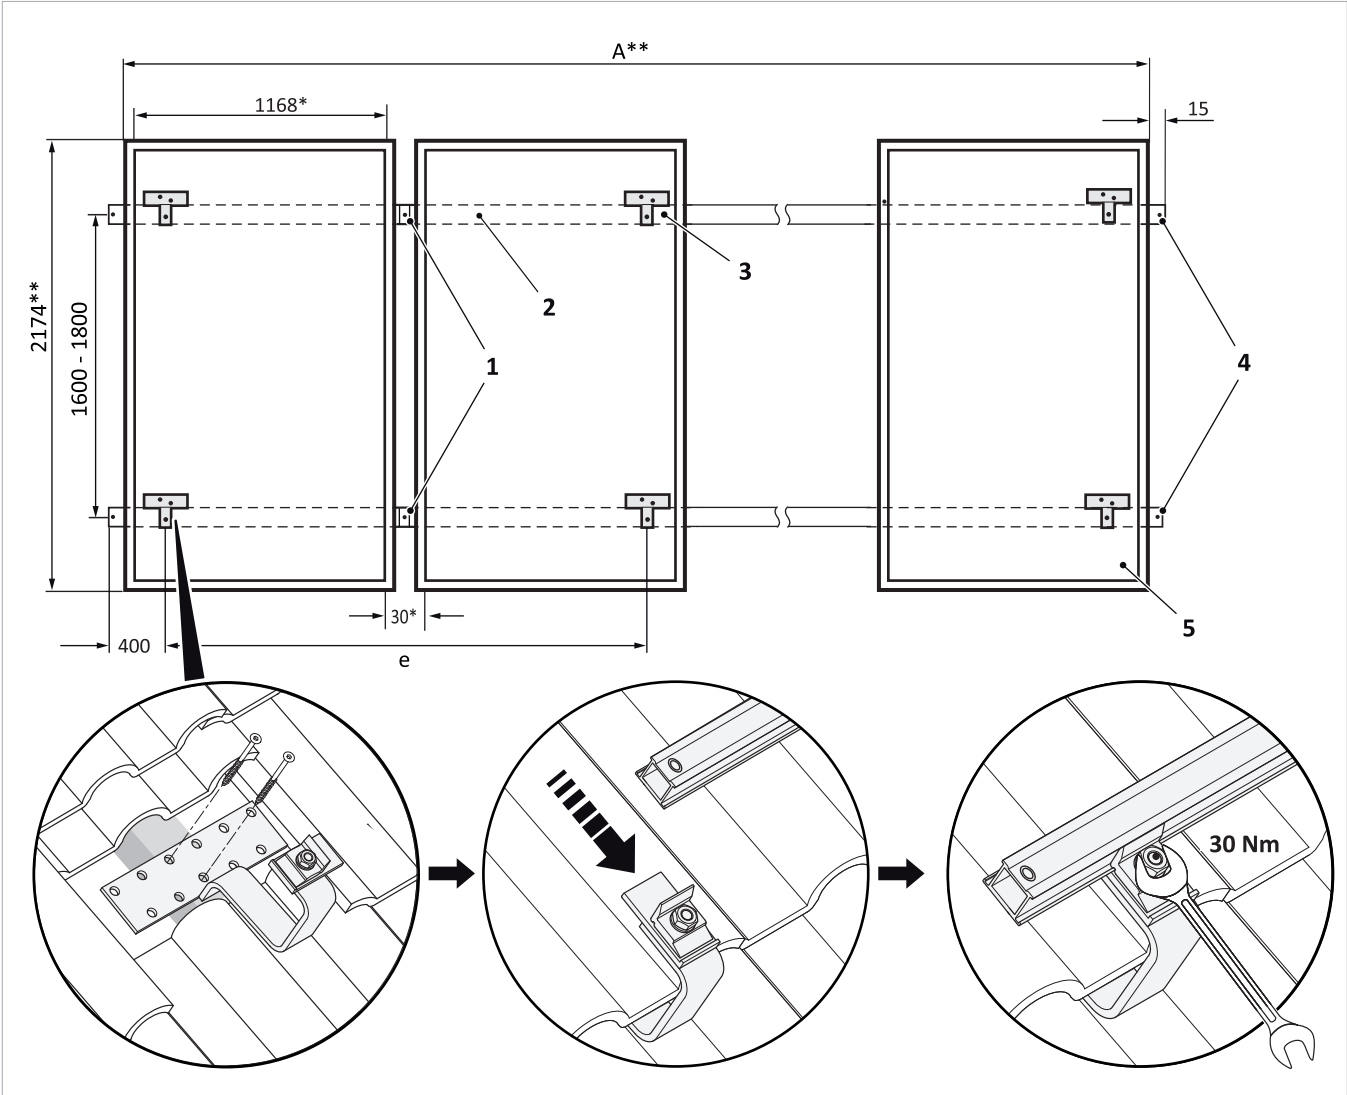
Horizontal installation of the roof brackets and mounting rails.
